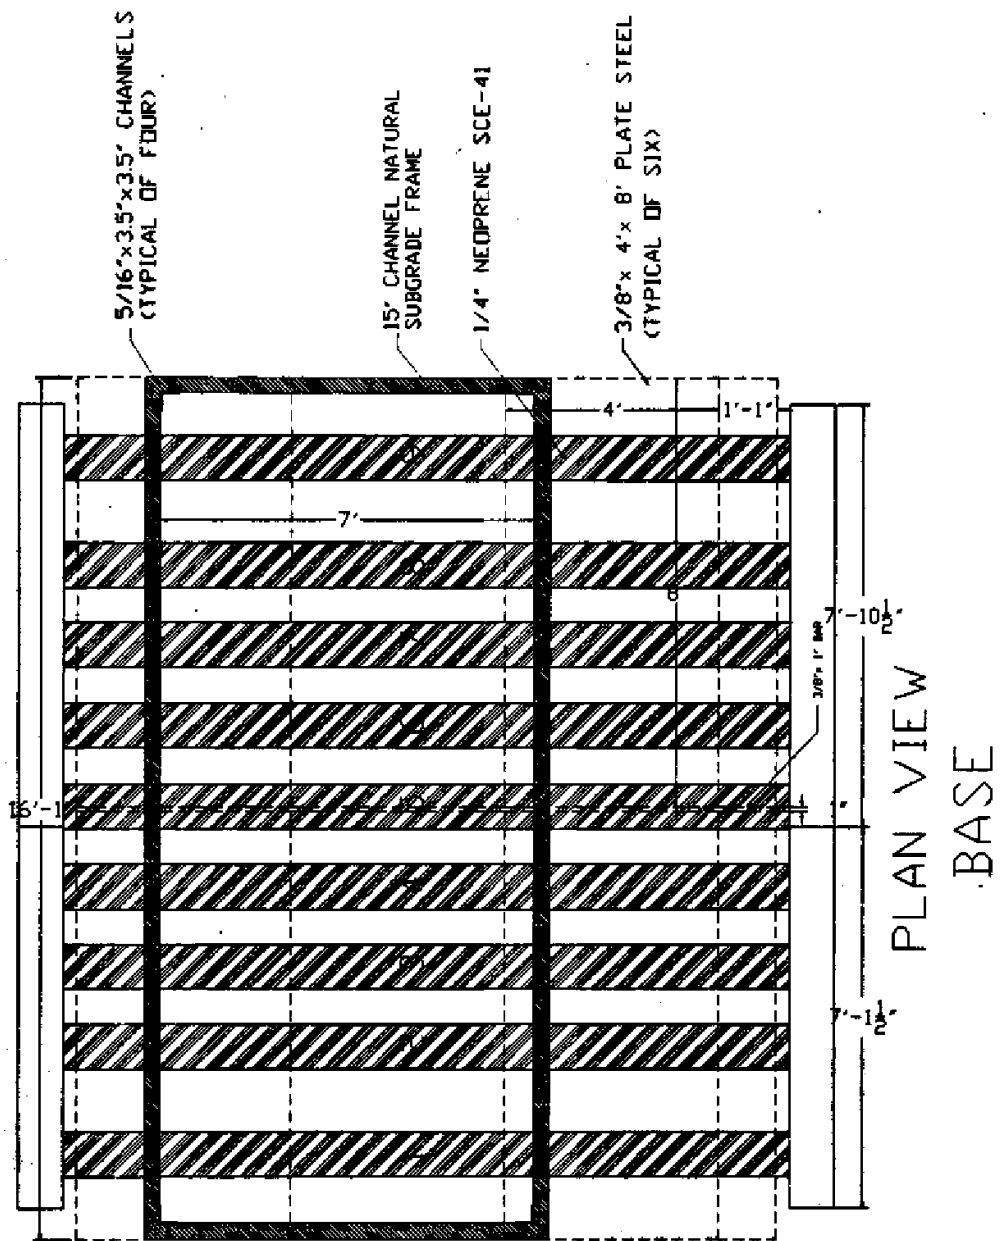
BASE PLAN VIEW OF MINNE-ALF TEST FACILITY [17]
